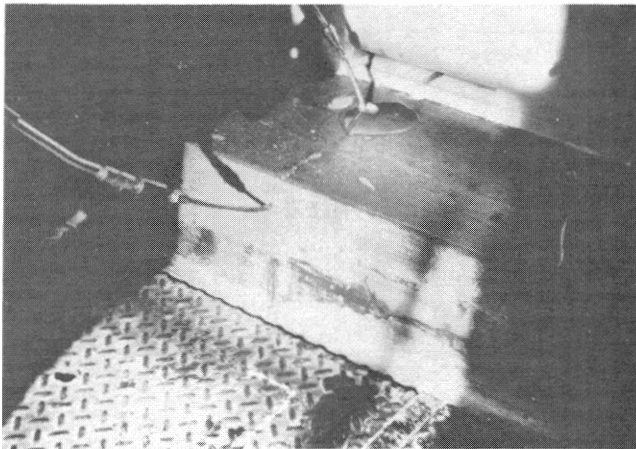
Pressure-Grouting a Crack Caused by Stress Risers around Sharp Sole Plate Corners. Pressure-Grouting Repairs the Grout in a Stress Relieved Condition.
